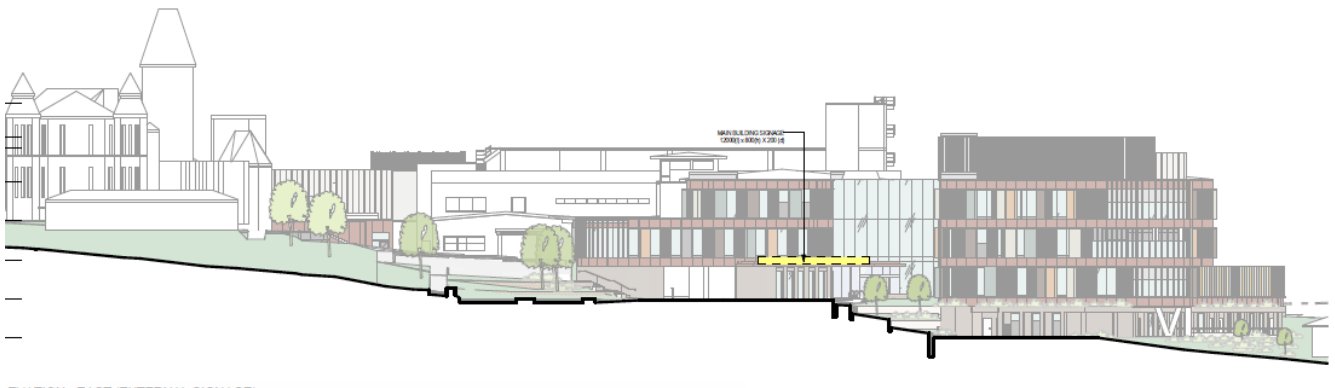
Extract of the elevation section plan showing the siting and height of the new build compared to the Heritage Building siting. (courtesy: Billard Leece Partnership, 2024)
